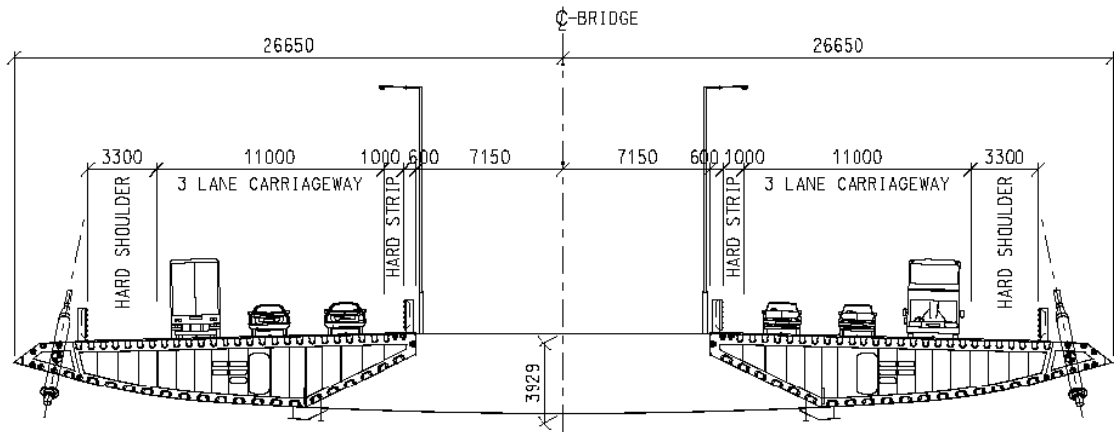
Deck cross-section of the Stonecutters Bridge in Hong Kong (Dimensions in mm)
